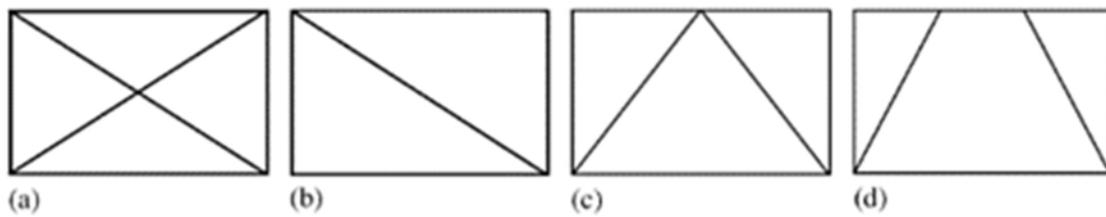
Types of Braces: (a) X-bracing, (b) diagonal-bracing, (c) K-bracing, (d) knee-bracing<sup>24</sup>
